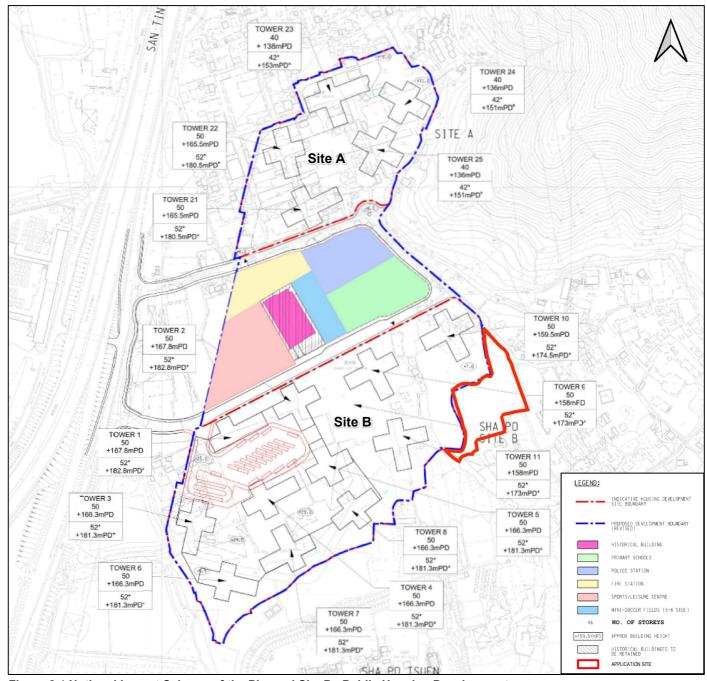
Notional Layout Scheme of the Planned Sha Po Public Housing Development
